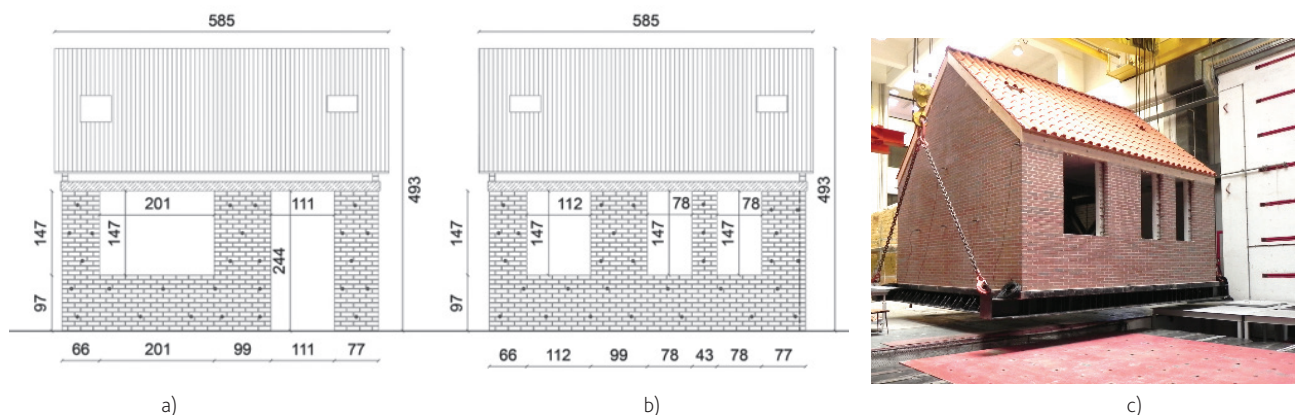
Elevations views of the inner CS walls (a, North; b, South) and picture of the specimen during transportation to the shake table (c). Units of cm
